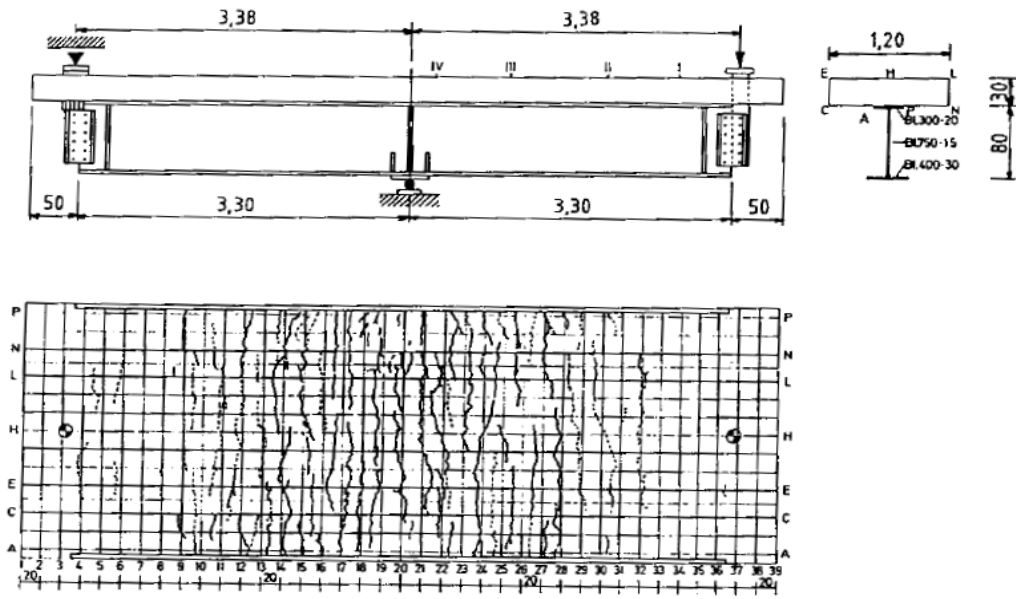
Test Setup and Slab Cracking in Double Composite Girder Test [1.8]
